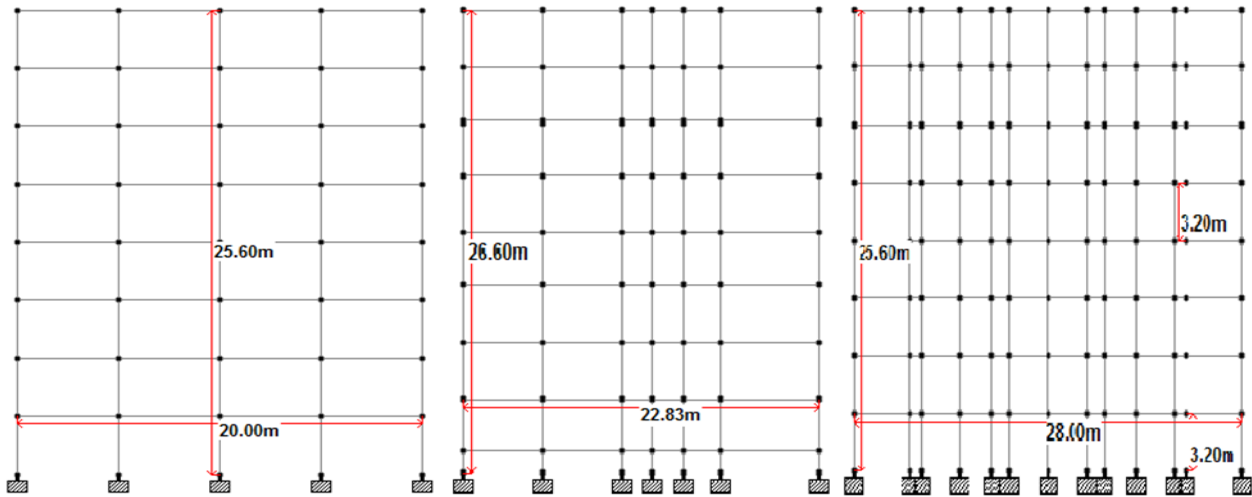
Basic Plan & Elevation of the models of 8th storey
